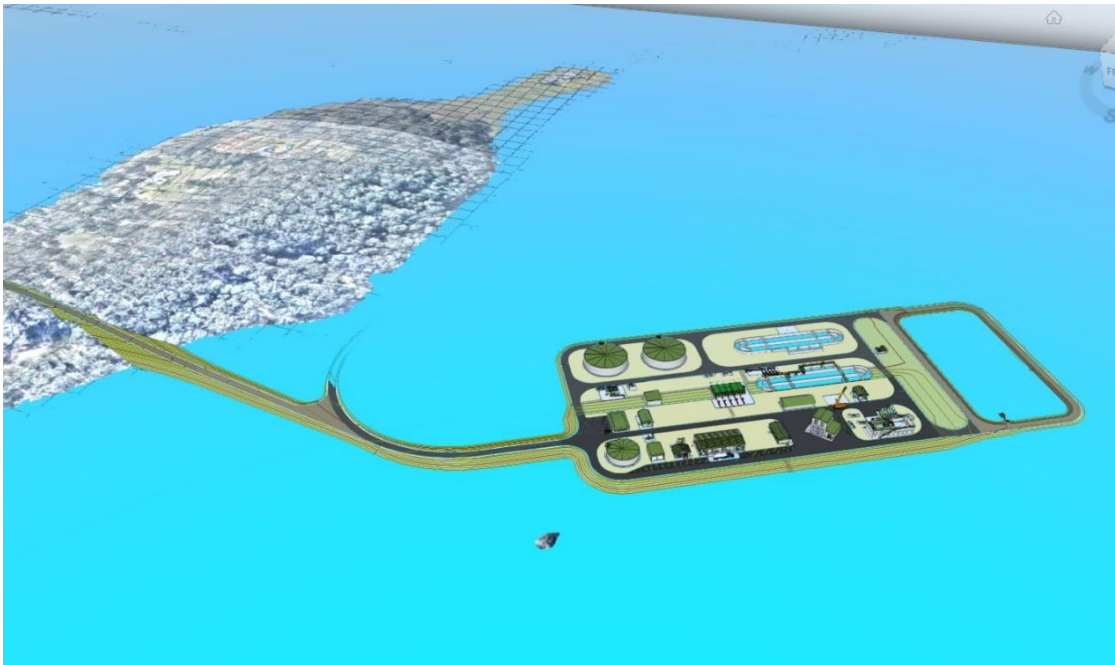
The proposed wastewater plant layout showing the raised embankment compared to the 1% AEP flood event level, which is 1.55 m higher than the May 2025 event
